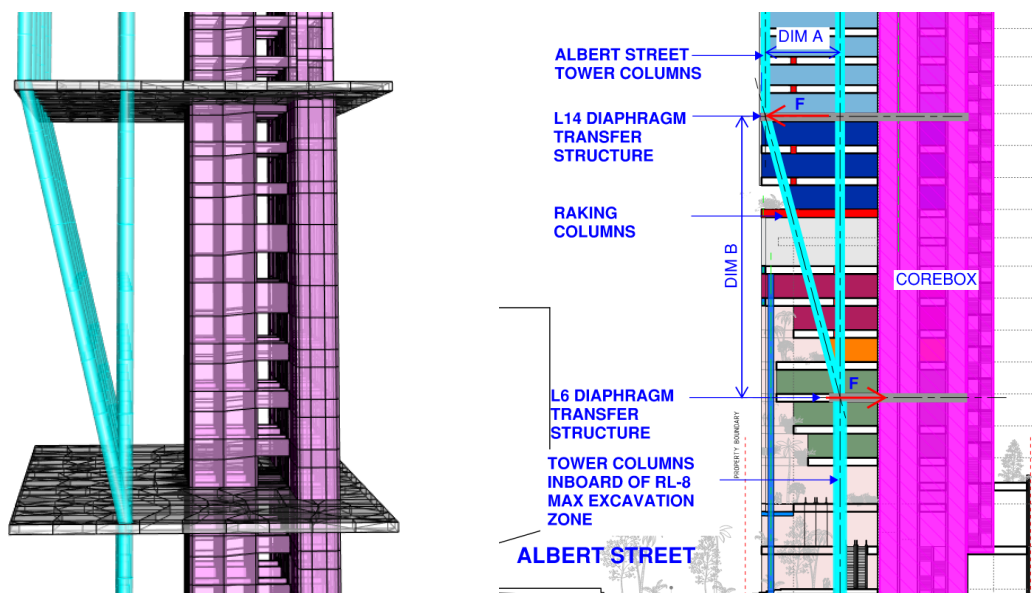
i) & ii) - 3D View and Section of the Single Directional Building Transfer
